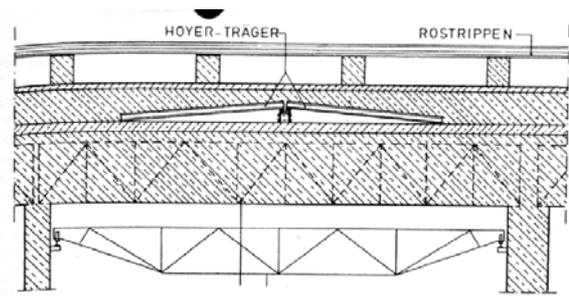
Cross-section through roof of an early German submarine pen built during World War II using Melan girders embedded in the concrete that doubles as support for the formwork and the reinforcement of the concrete structure. Relieving Hoyer beams and a grating on top provide additional bomb protection. (Grote and Marrey)
